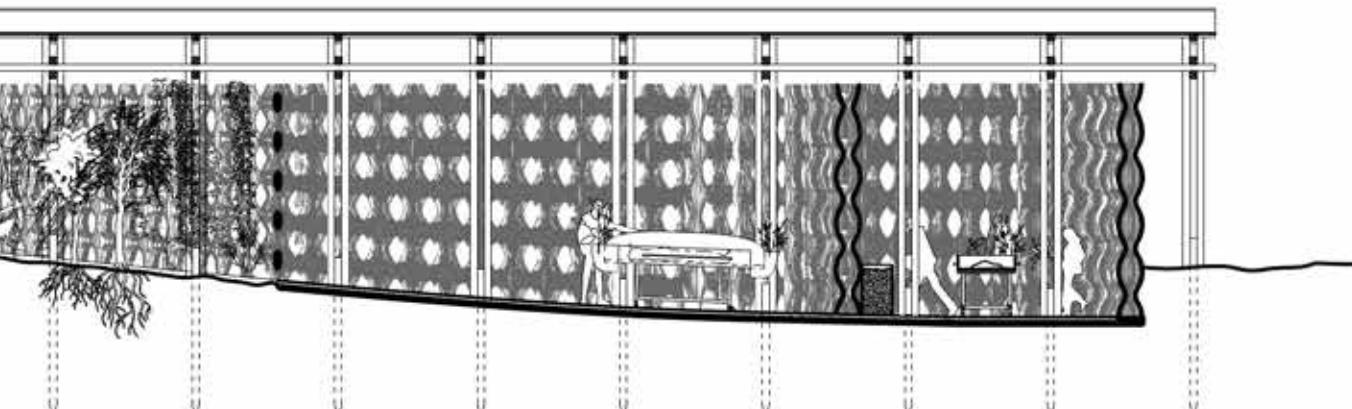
Flowering pavilion facing Crematory A, plan and section I:I30. by Author. (2023). [drawing]
